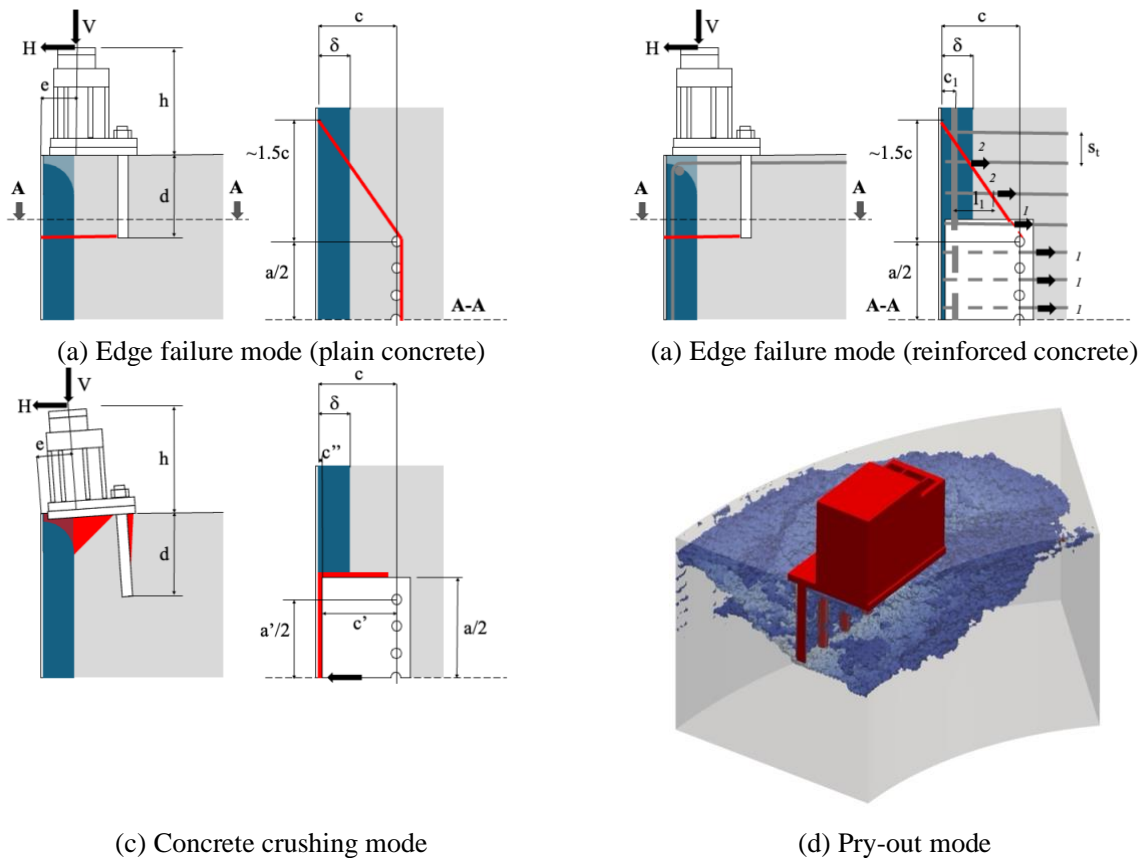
Hypothetical failure modes of the (reinforced) concrete below the nozzle shoe support.
